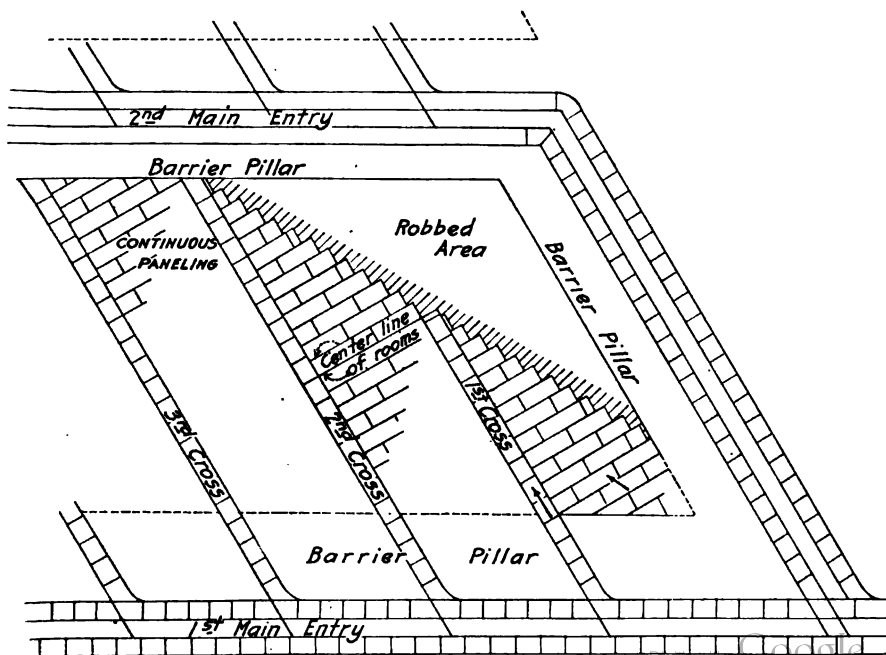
TYPICAL PLAN OF MINING ON THE PANEL SYSTEM.
